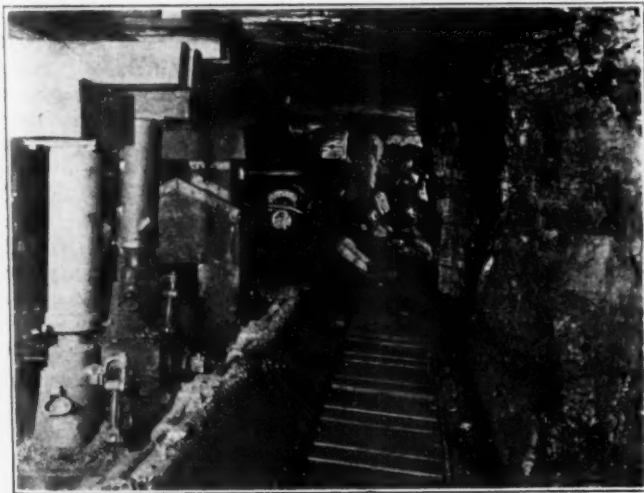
NO. 2 MACHINE AT WORK WITH HYDRAULIC JACKS IN PLACE PROTECTING IT
